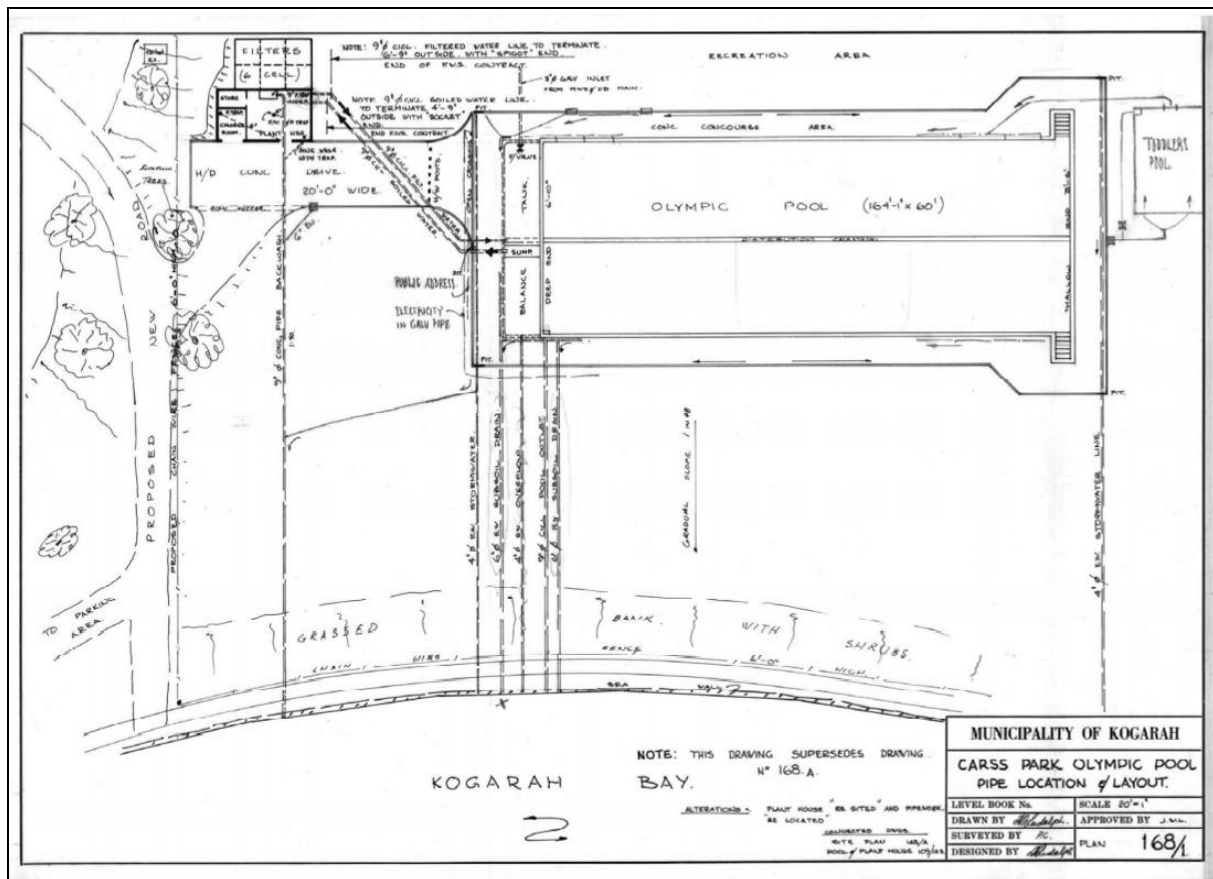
Detail plan showing the pipe location and layout and indicates the later addition of the Toddlers' Pool and grassed banks with shrubs along the sea wall. (Georges River Council, Plan No. 168/1)
